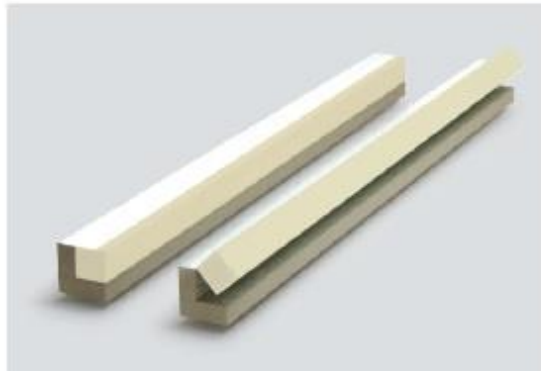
Window installation system ISO TOP WINFRAME TYP 2
